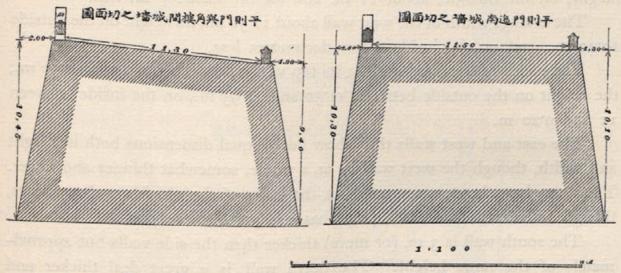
Two sections of the west wall, south of P'ing Tzu Men.
